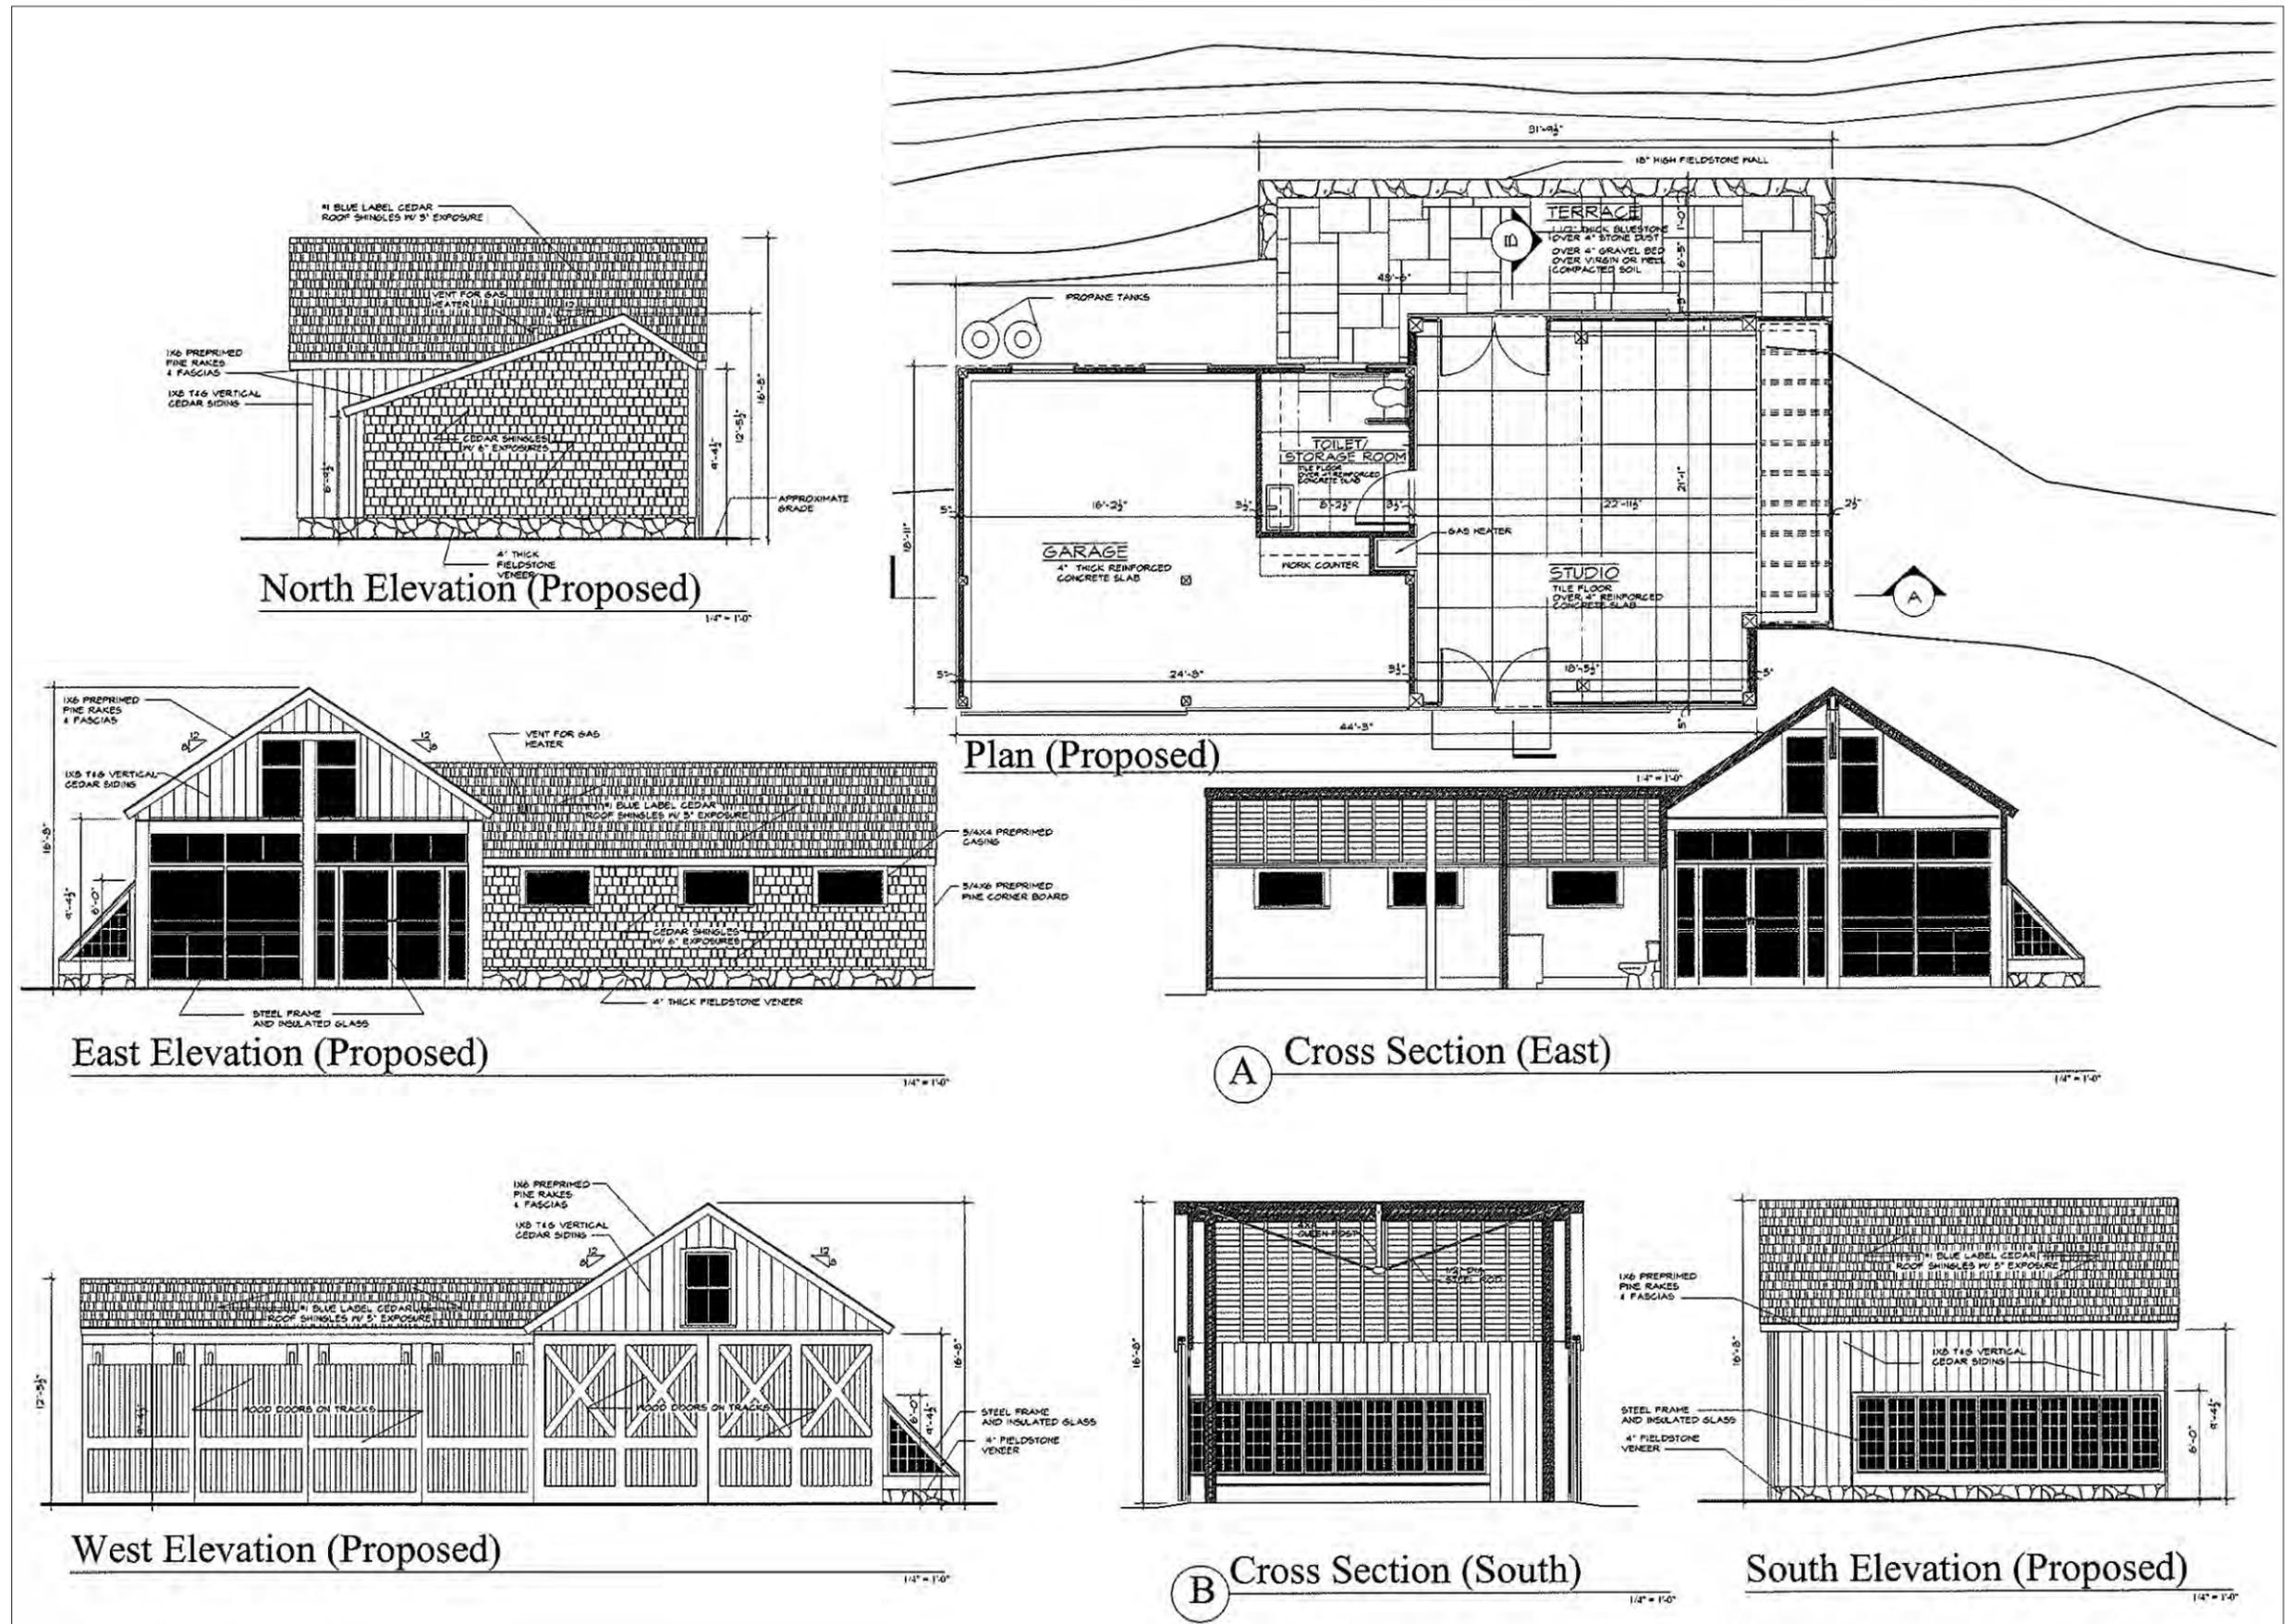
Plan, sections, and elevations of the Carriage House and Caretaker's Garage (Fasey Smith Architects, PC).
